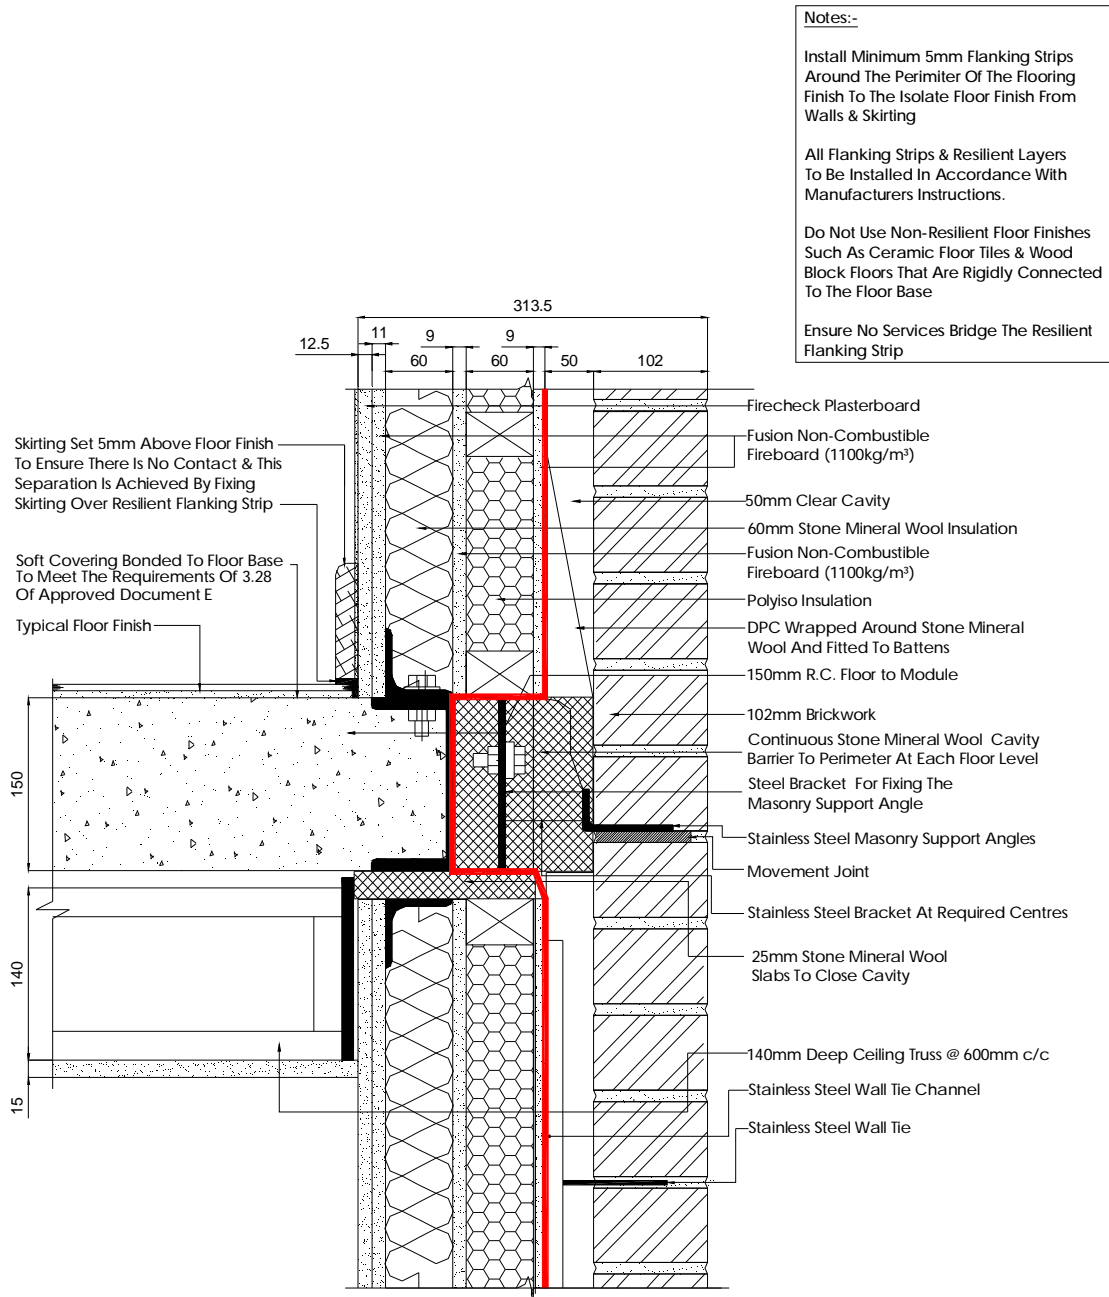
, Floor to External wall junction with masonry cladding (vertical section)
